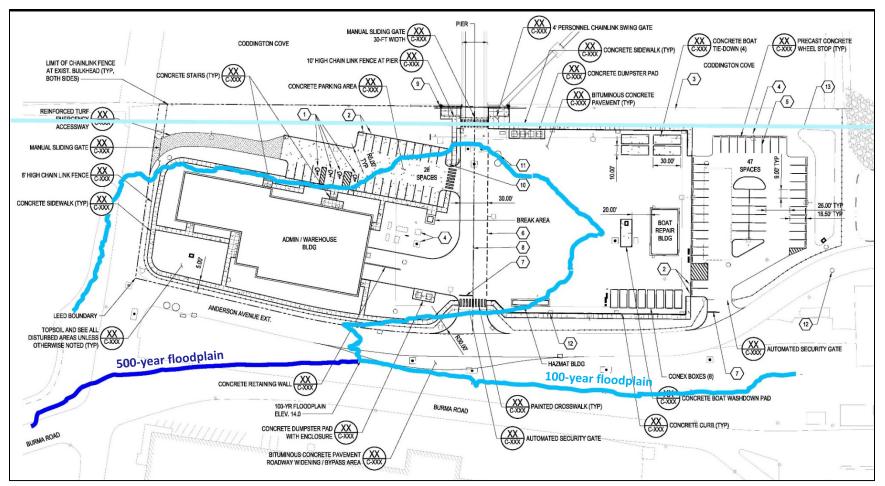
Proposed Development of Pier Landing Site and Location of Floodplains
